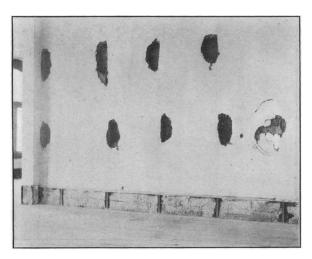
DEFECTIVE WALL IN LOFT OF BUILDING.
